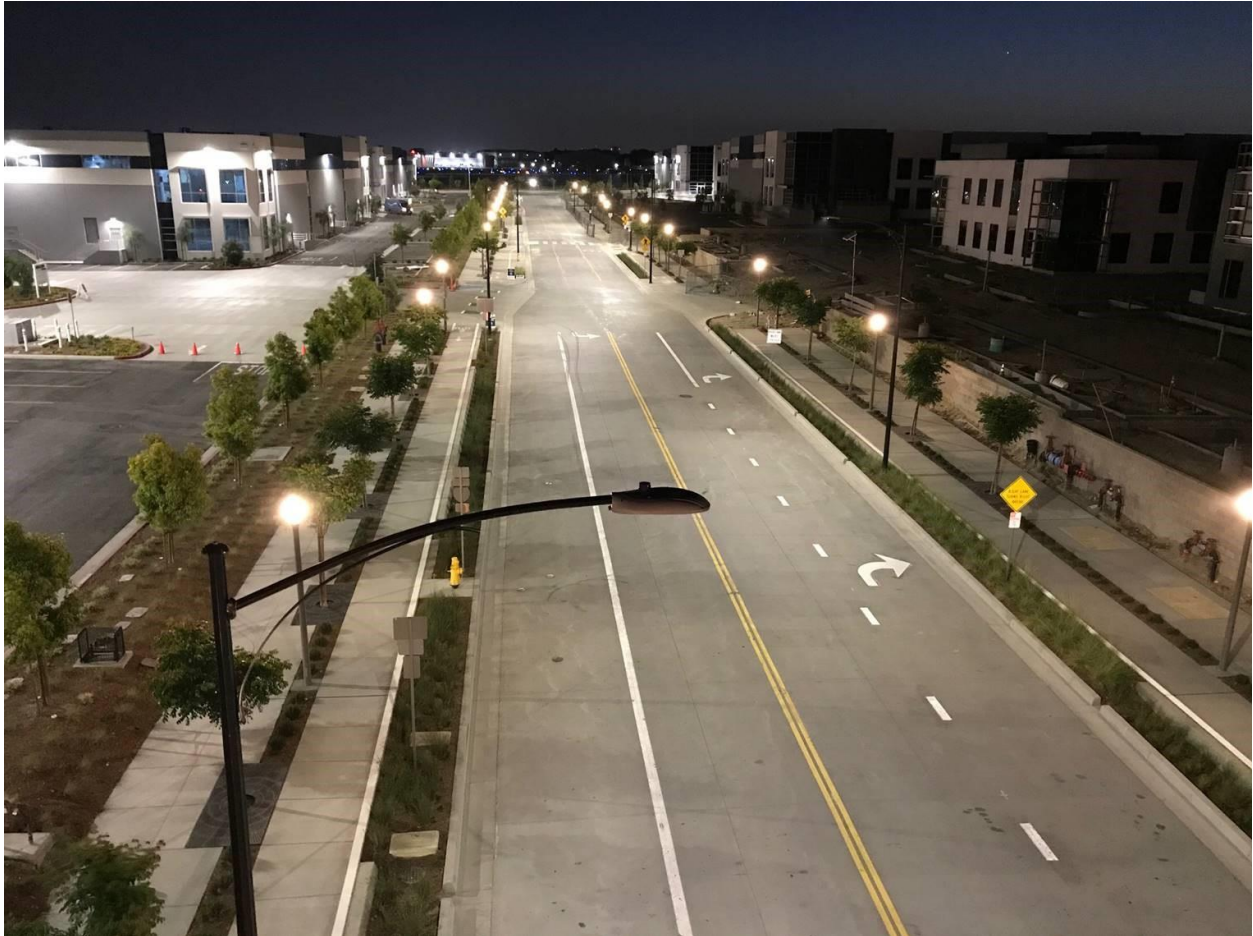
New street lighting system along Tulare Ave (looking west from Hollywood Way)
